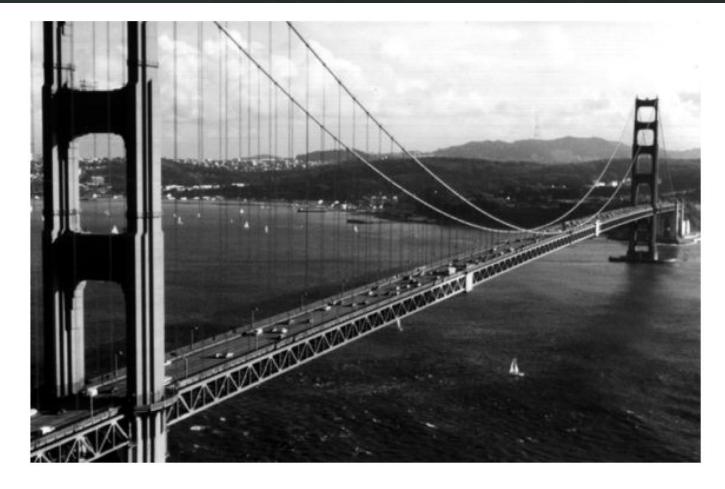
Golden Gate Bridge, San Francisco, California. The fundamental natural vibration periods of this suspension bridge with the main span of 4200 ft are 18.2 sec for transverse vibration, 10.9 sec for vertical vibration, 3.81 sec for longitudinal vibration, and 4.43 sec for torsional vibration. These vibration properties were determined from recorded motions of the bridge under ambient (wind, traffic, etc.) conditions. (Courtesy of International Structural Slides.)
